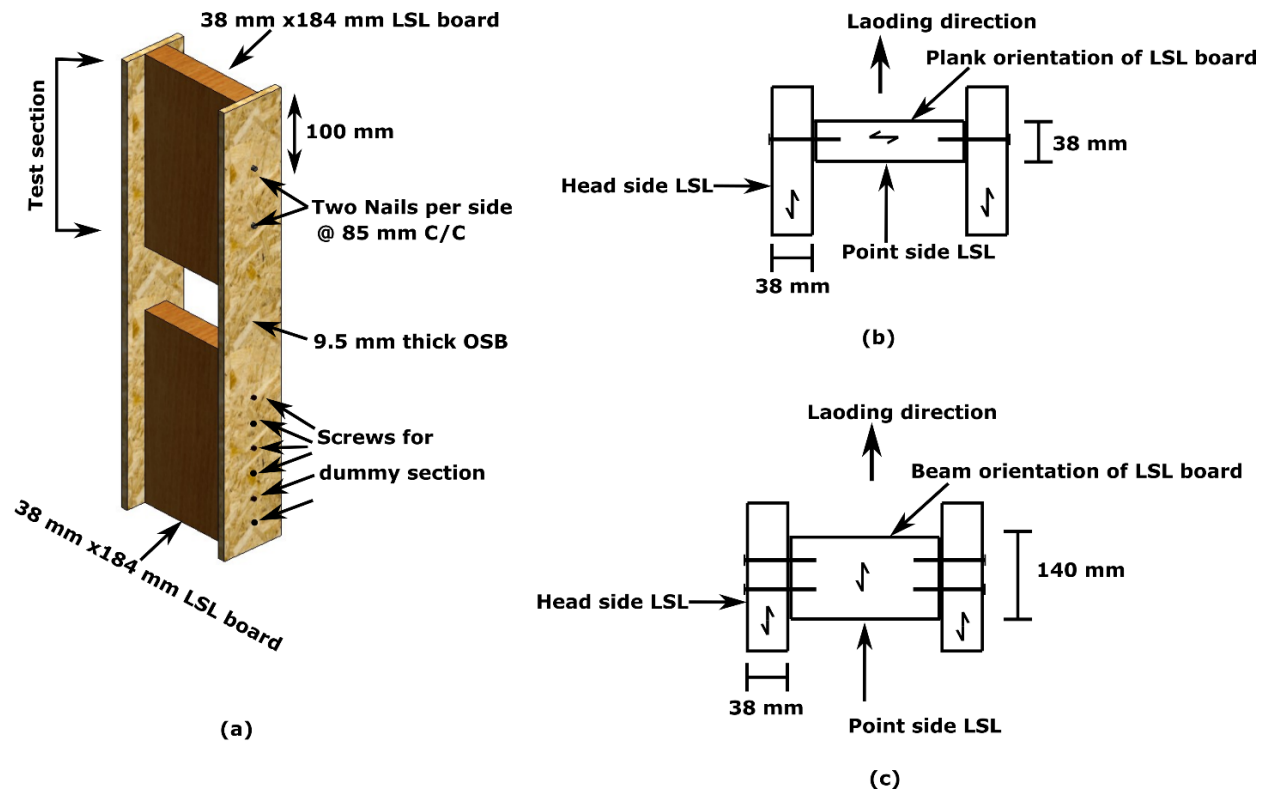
(a) Sample A construction details (b) Nail connection loading LSL in plank orientation of LSL point side member (c) Nail connection loading LSL in beam orientation of LSL point side.
